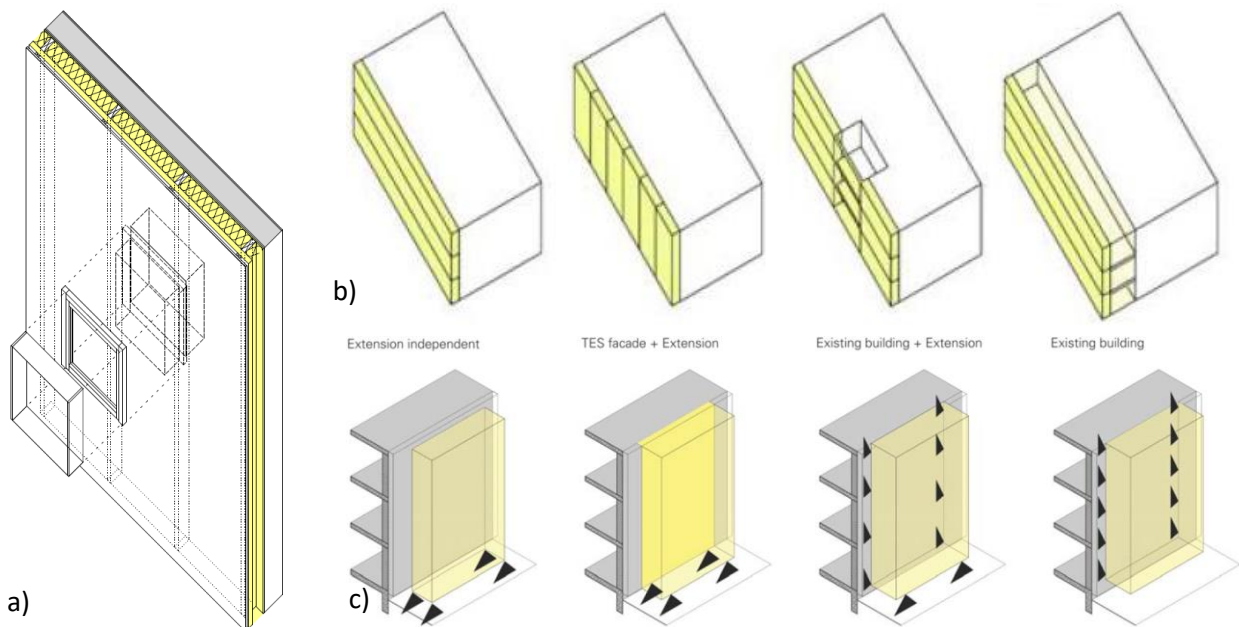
a) Basic TES element with insulation, panelling and structure ; b) horizontal and vertical division – spatial enclosure and extension; c) typology of mounting elements – Source: [85]
